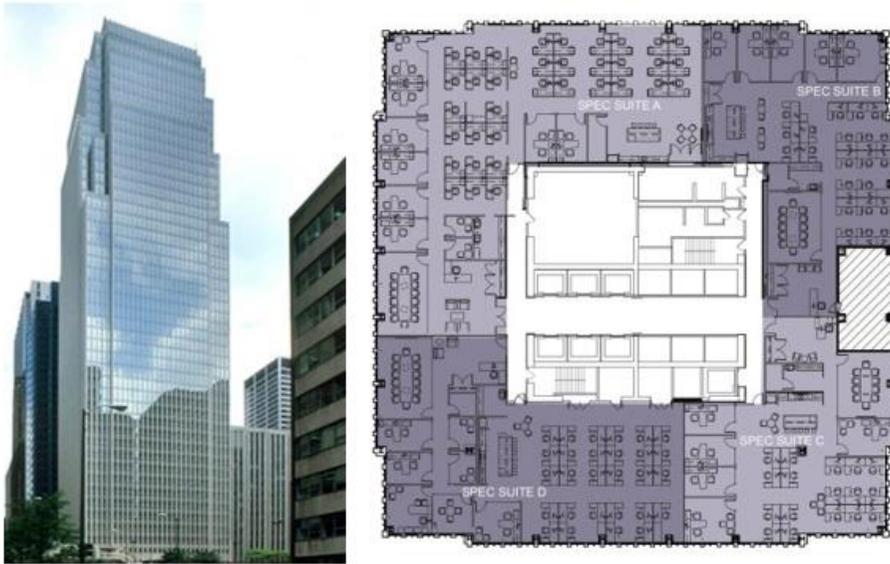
181 West Madison Street, (left), Characteristic Floor Plan (right) [144, 143]
